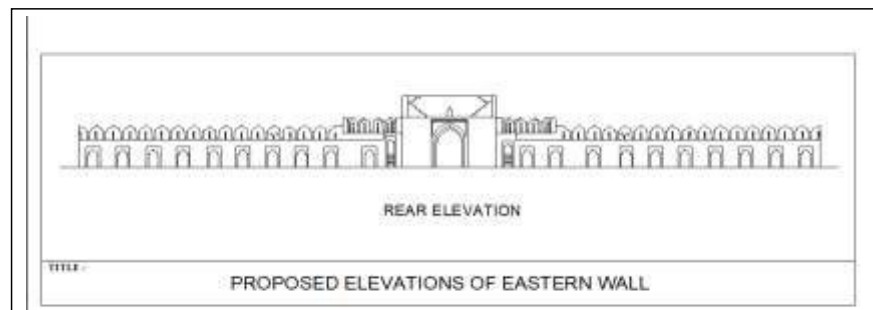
Proposed Elevation Plan (Rear Elevation) of Eastern Wall of Rewat Fort (after Saeed 2020, p.50)
